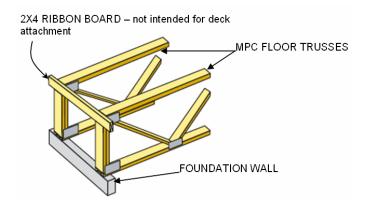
Metal plate connected wood floor trusses with a 2x4 lumber "ribbon" at the ends of the trusses
